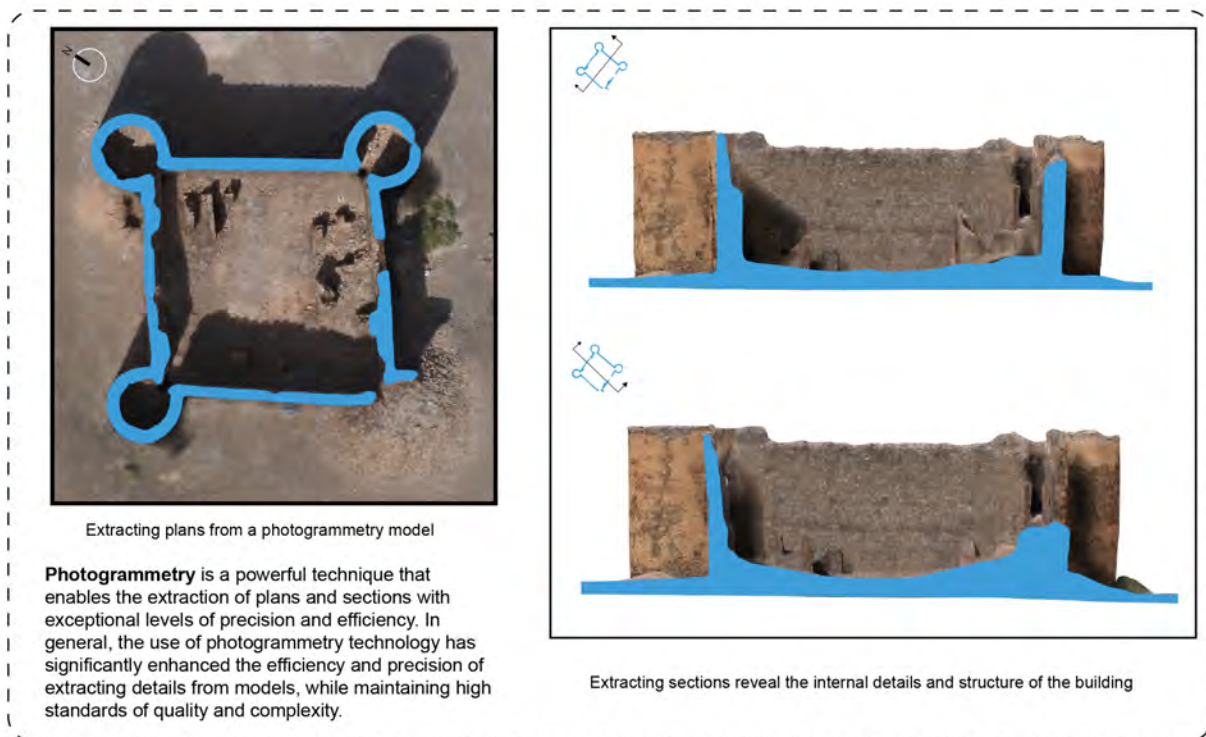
The Extraction of plan and sections reveal the internal details and structure of the building (Author, 2023)
